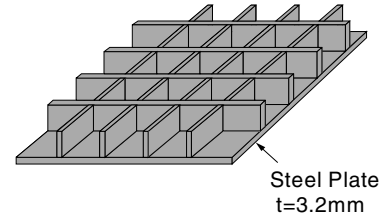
Detail of composite wall panel in WCO and WCOT specimens.
